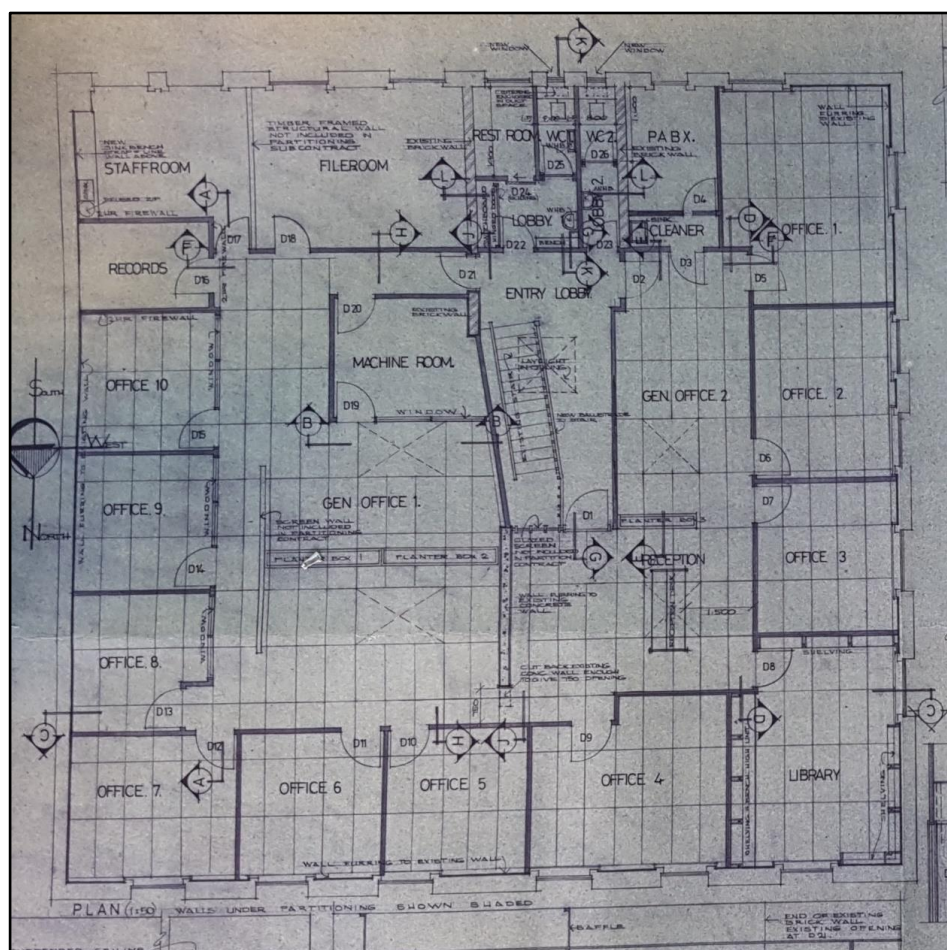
Details from 1979 plan of the Temple Chambers at 45-49 Esk Street, showing alterations to first floor plan (Lucking & Vial, 1979).
